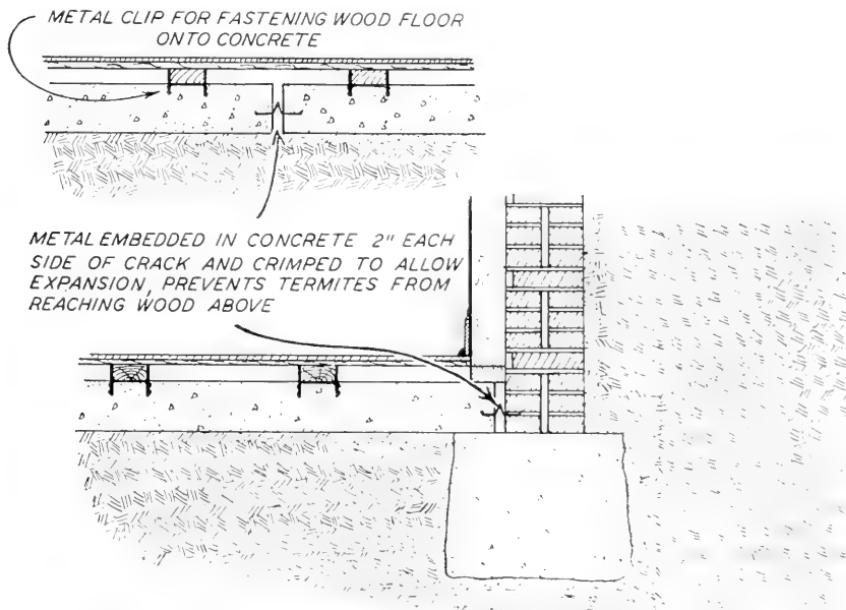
Metal expansion joints installed to prevent entry of termites in union between concrete floor and wall and between two sections of concrete floor. Many modern buildings are infested through these unprotected points. The sleepers are held by metal clips instead of being embedded in the concrete, as is usual. An alternative type of joint is shown in fig. 14.
